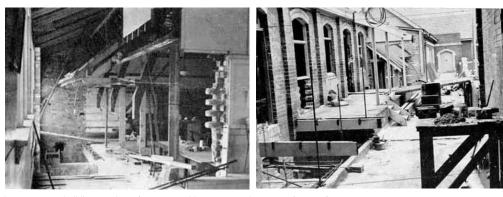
New buildings at Shore. (Source: Torchbearer, December 1960, after p128)
